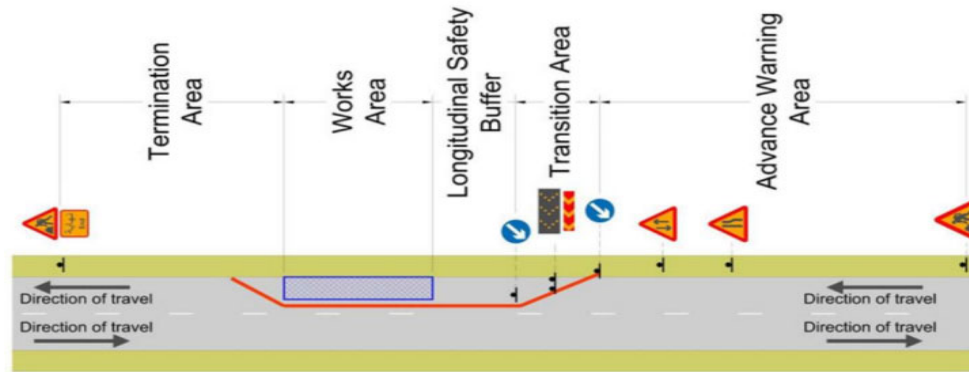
Typical example layout for an Advance Warning Area for a 2-lane road.
